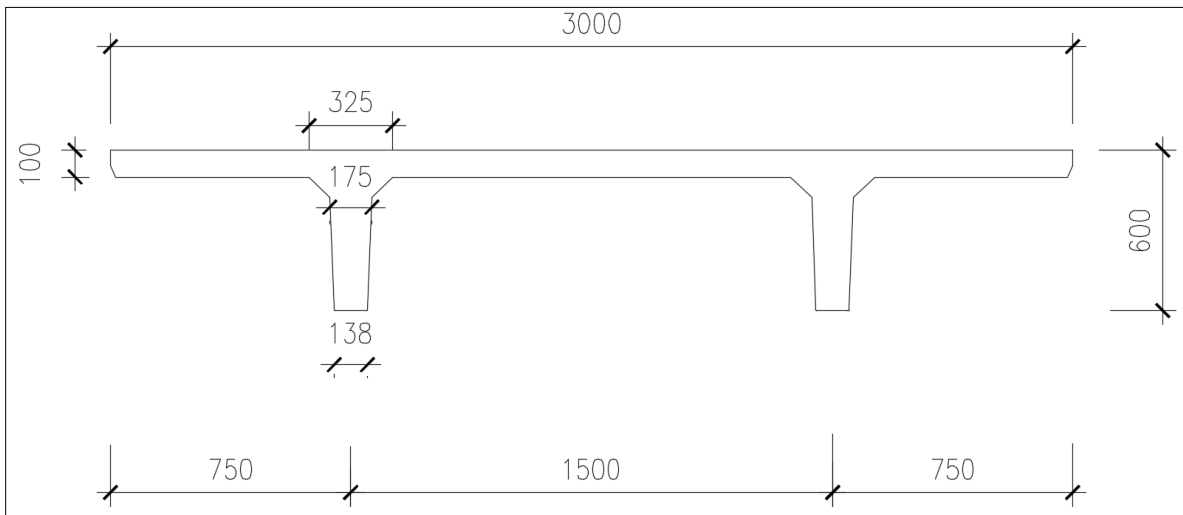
Proposed Sectional Geometry for Fully Precast Standard DT for Floor Slabs of Office Buildings for Indian Markets (all dimensions in mm)
